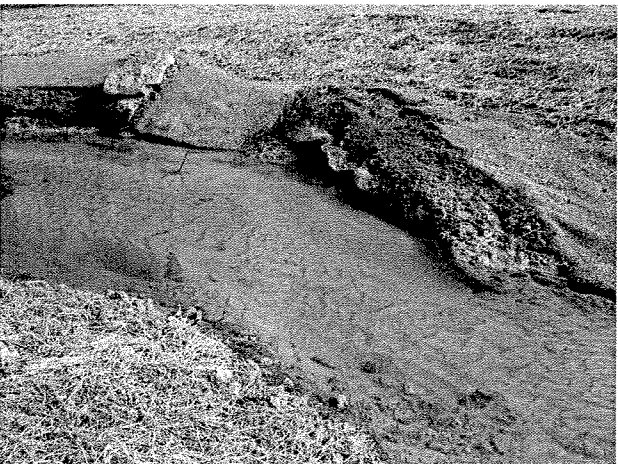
Looking downstream from MC Station 16+85. (9/27/04)
